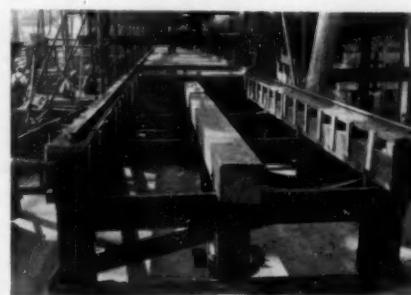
View from head of ways showing end of groundways and temporary railroad rails rigged ahead of end of groundways preparatory to installation of sliding ways.
